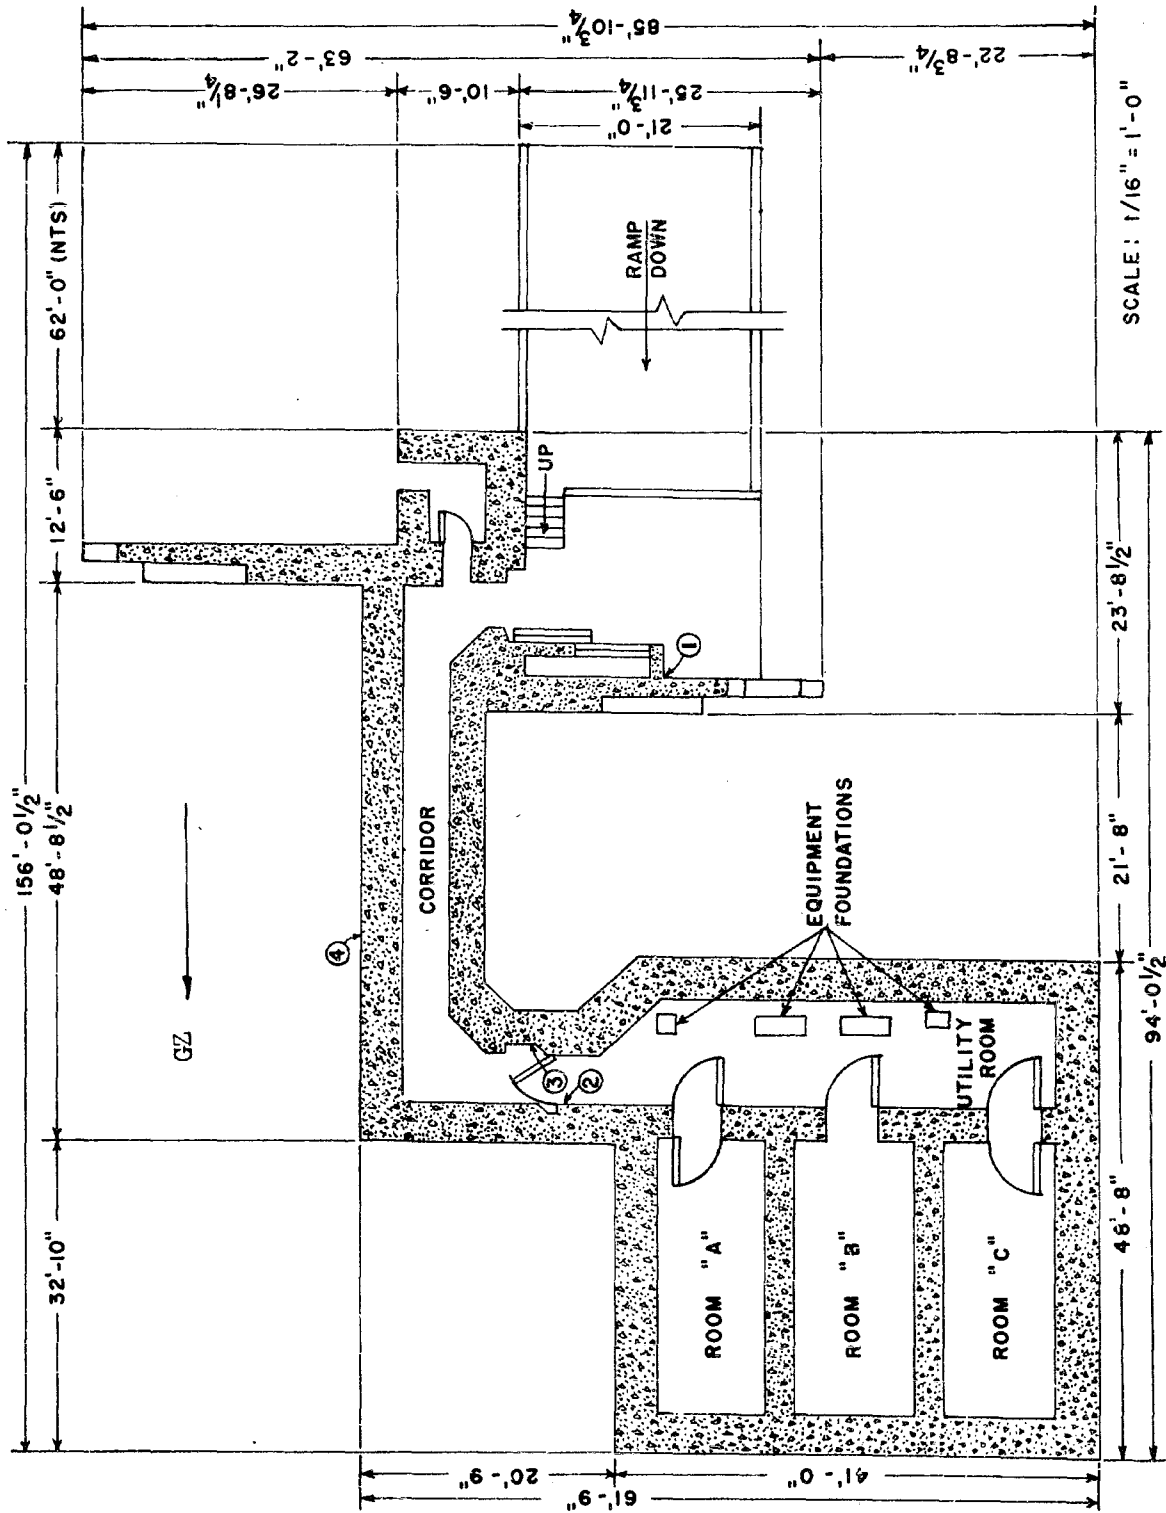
Floor Plan, Station 1200, Charlie Island, 7565 ft from GZ
